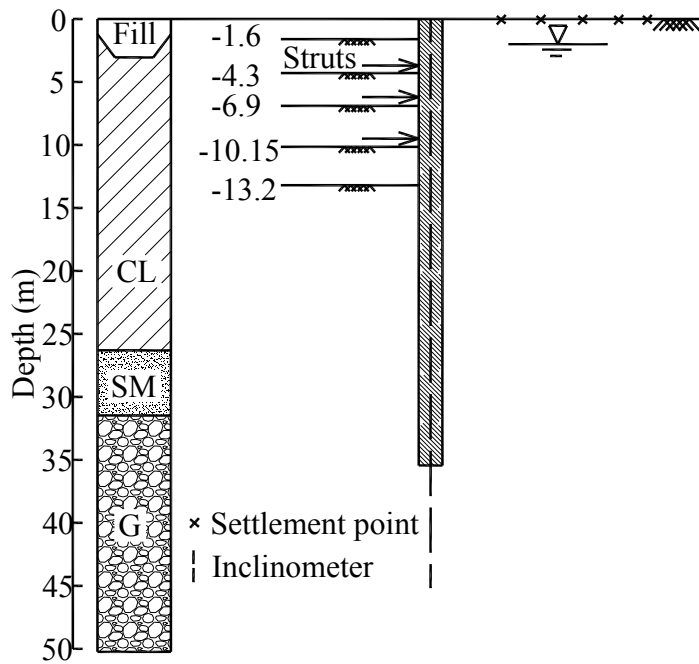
Cross section of the wall and soil layers in Formosa excavation
